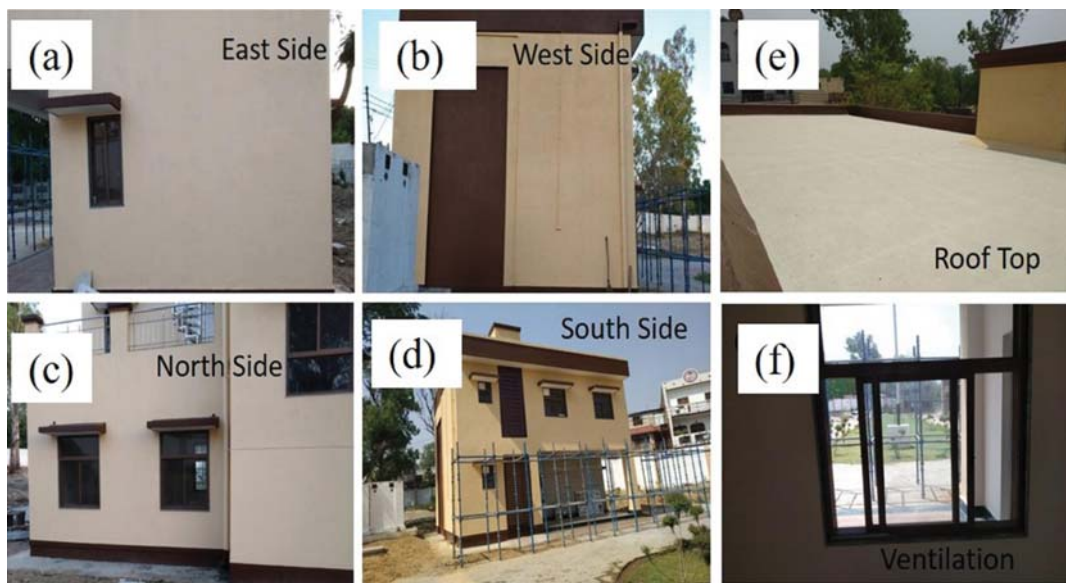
Directional faces, roof top and ventilated view of AAC building.
